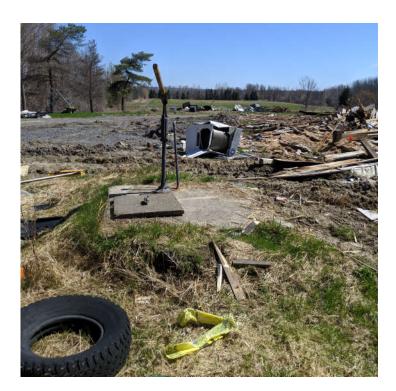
From existing driveway at 1070 March Road looking south - pond in distance
